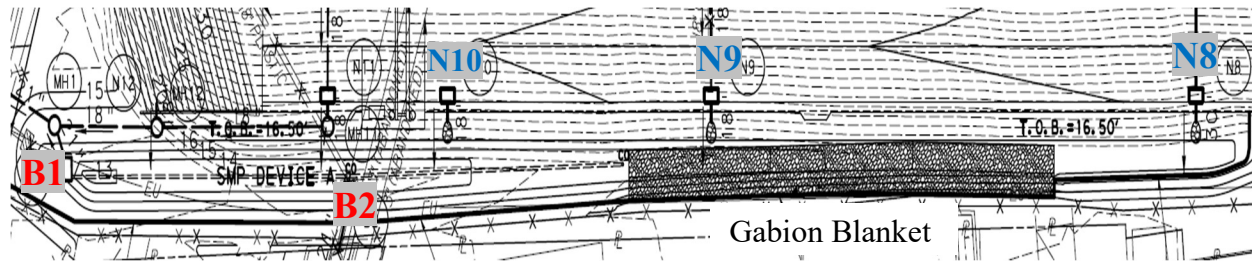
Inlet (Blue) and Outlet (Red) Structures
